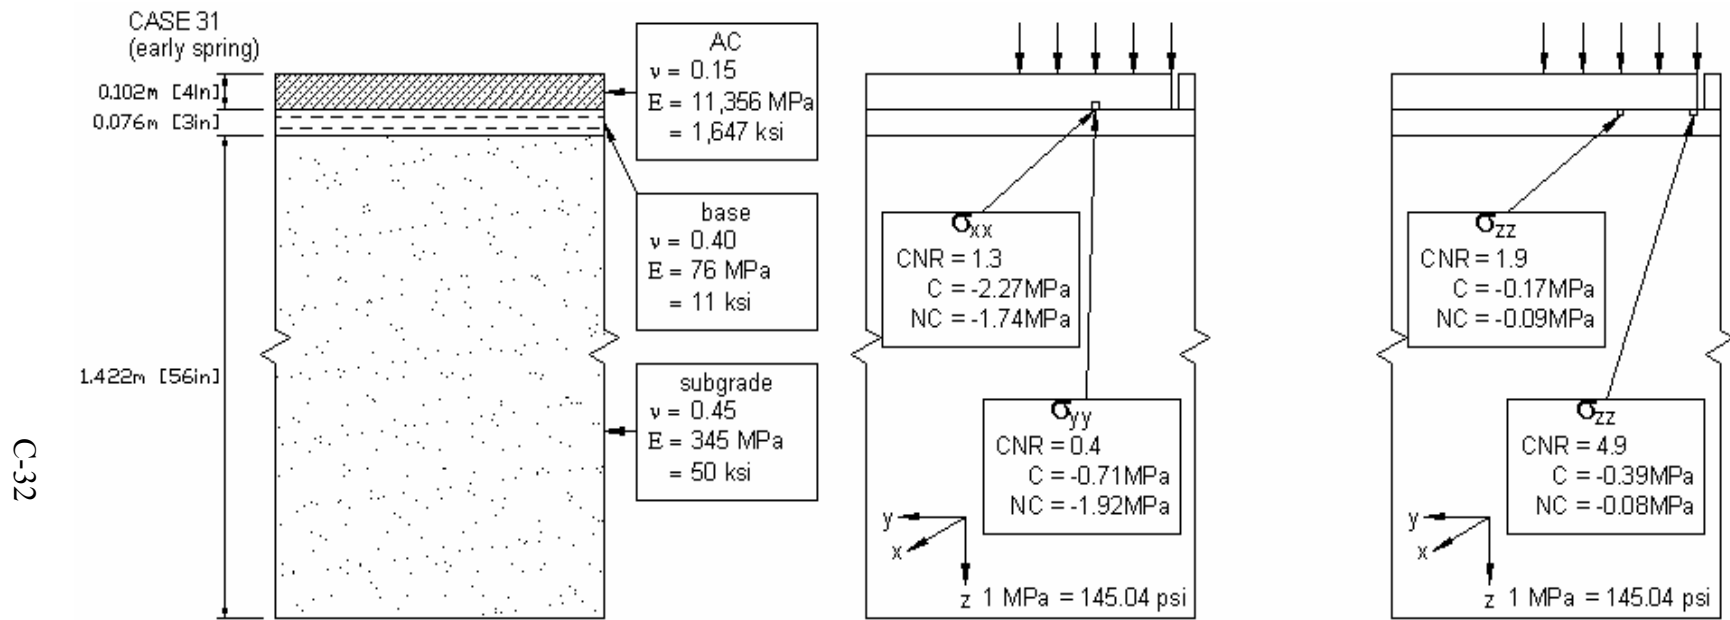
Summary cross section for case 31, (C – stress in cracked pavement, NC – stress in pavement with no crack, CNR – crack/no crack (stress) ratio)
